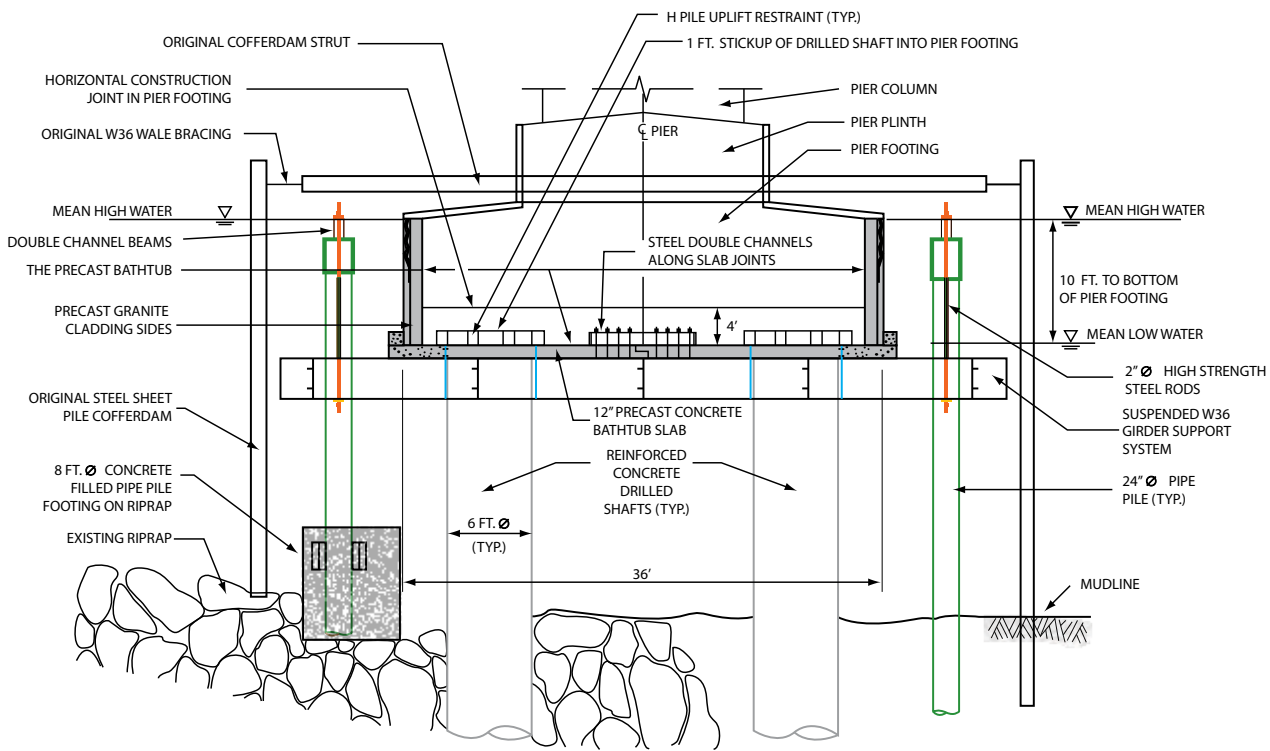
Typical Section Showing Pier, Precast Bath tub.
